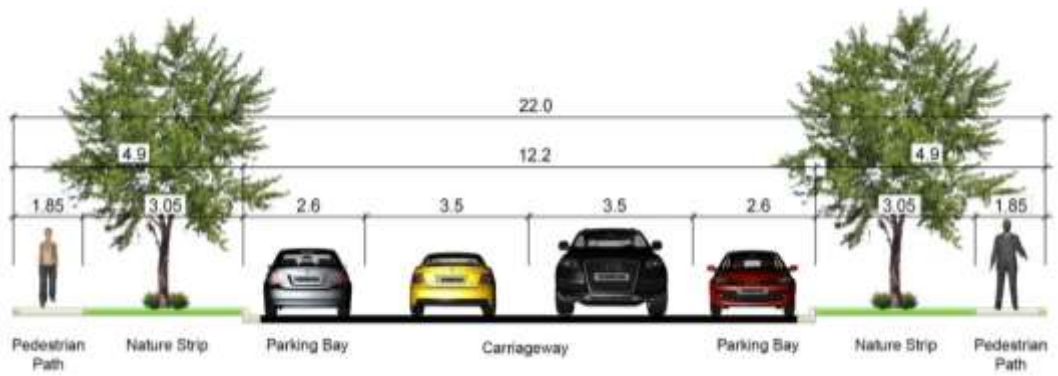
Typical Cross Section for an Industrial Zone Access Street
